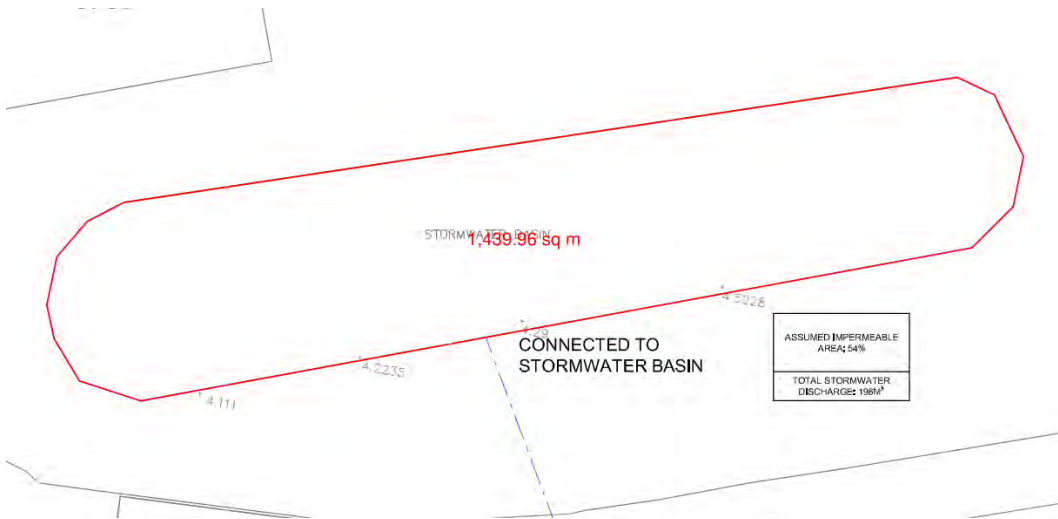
Proposed Stormwater basin (taken from Hydraulic Services Plan, VIC-BAR-HYD-A002, Rev B)
